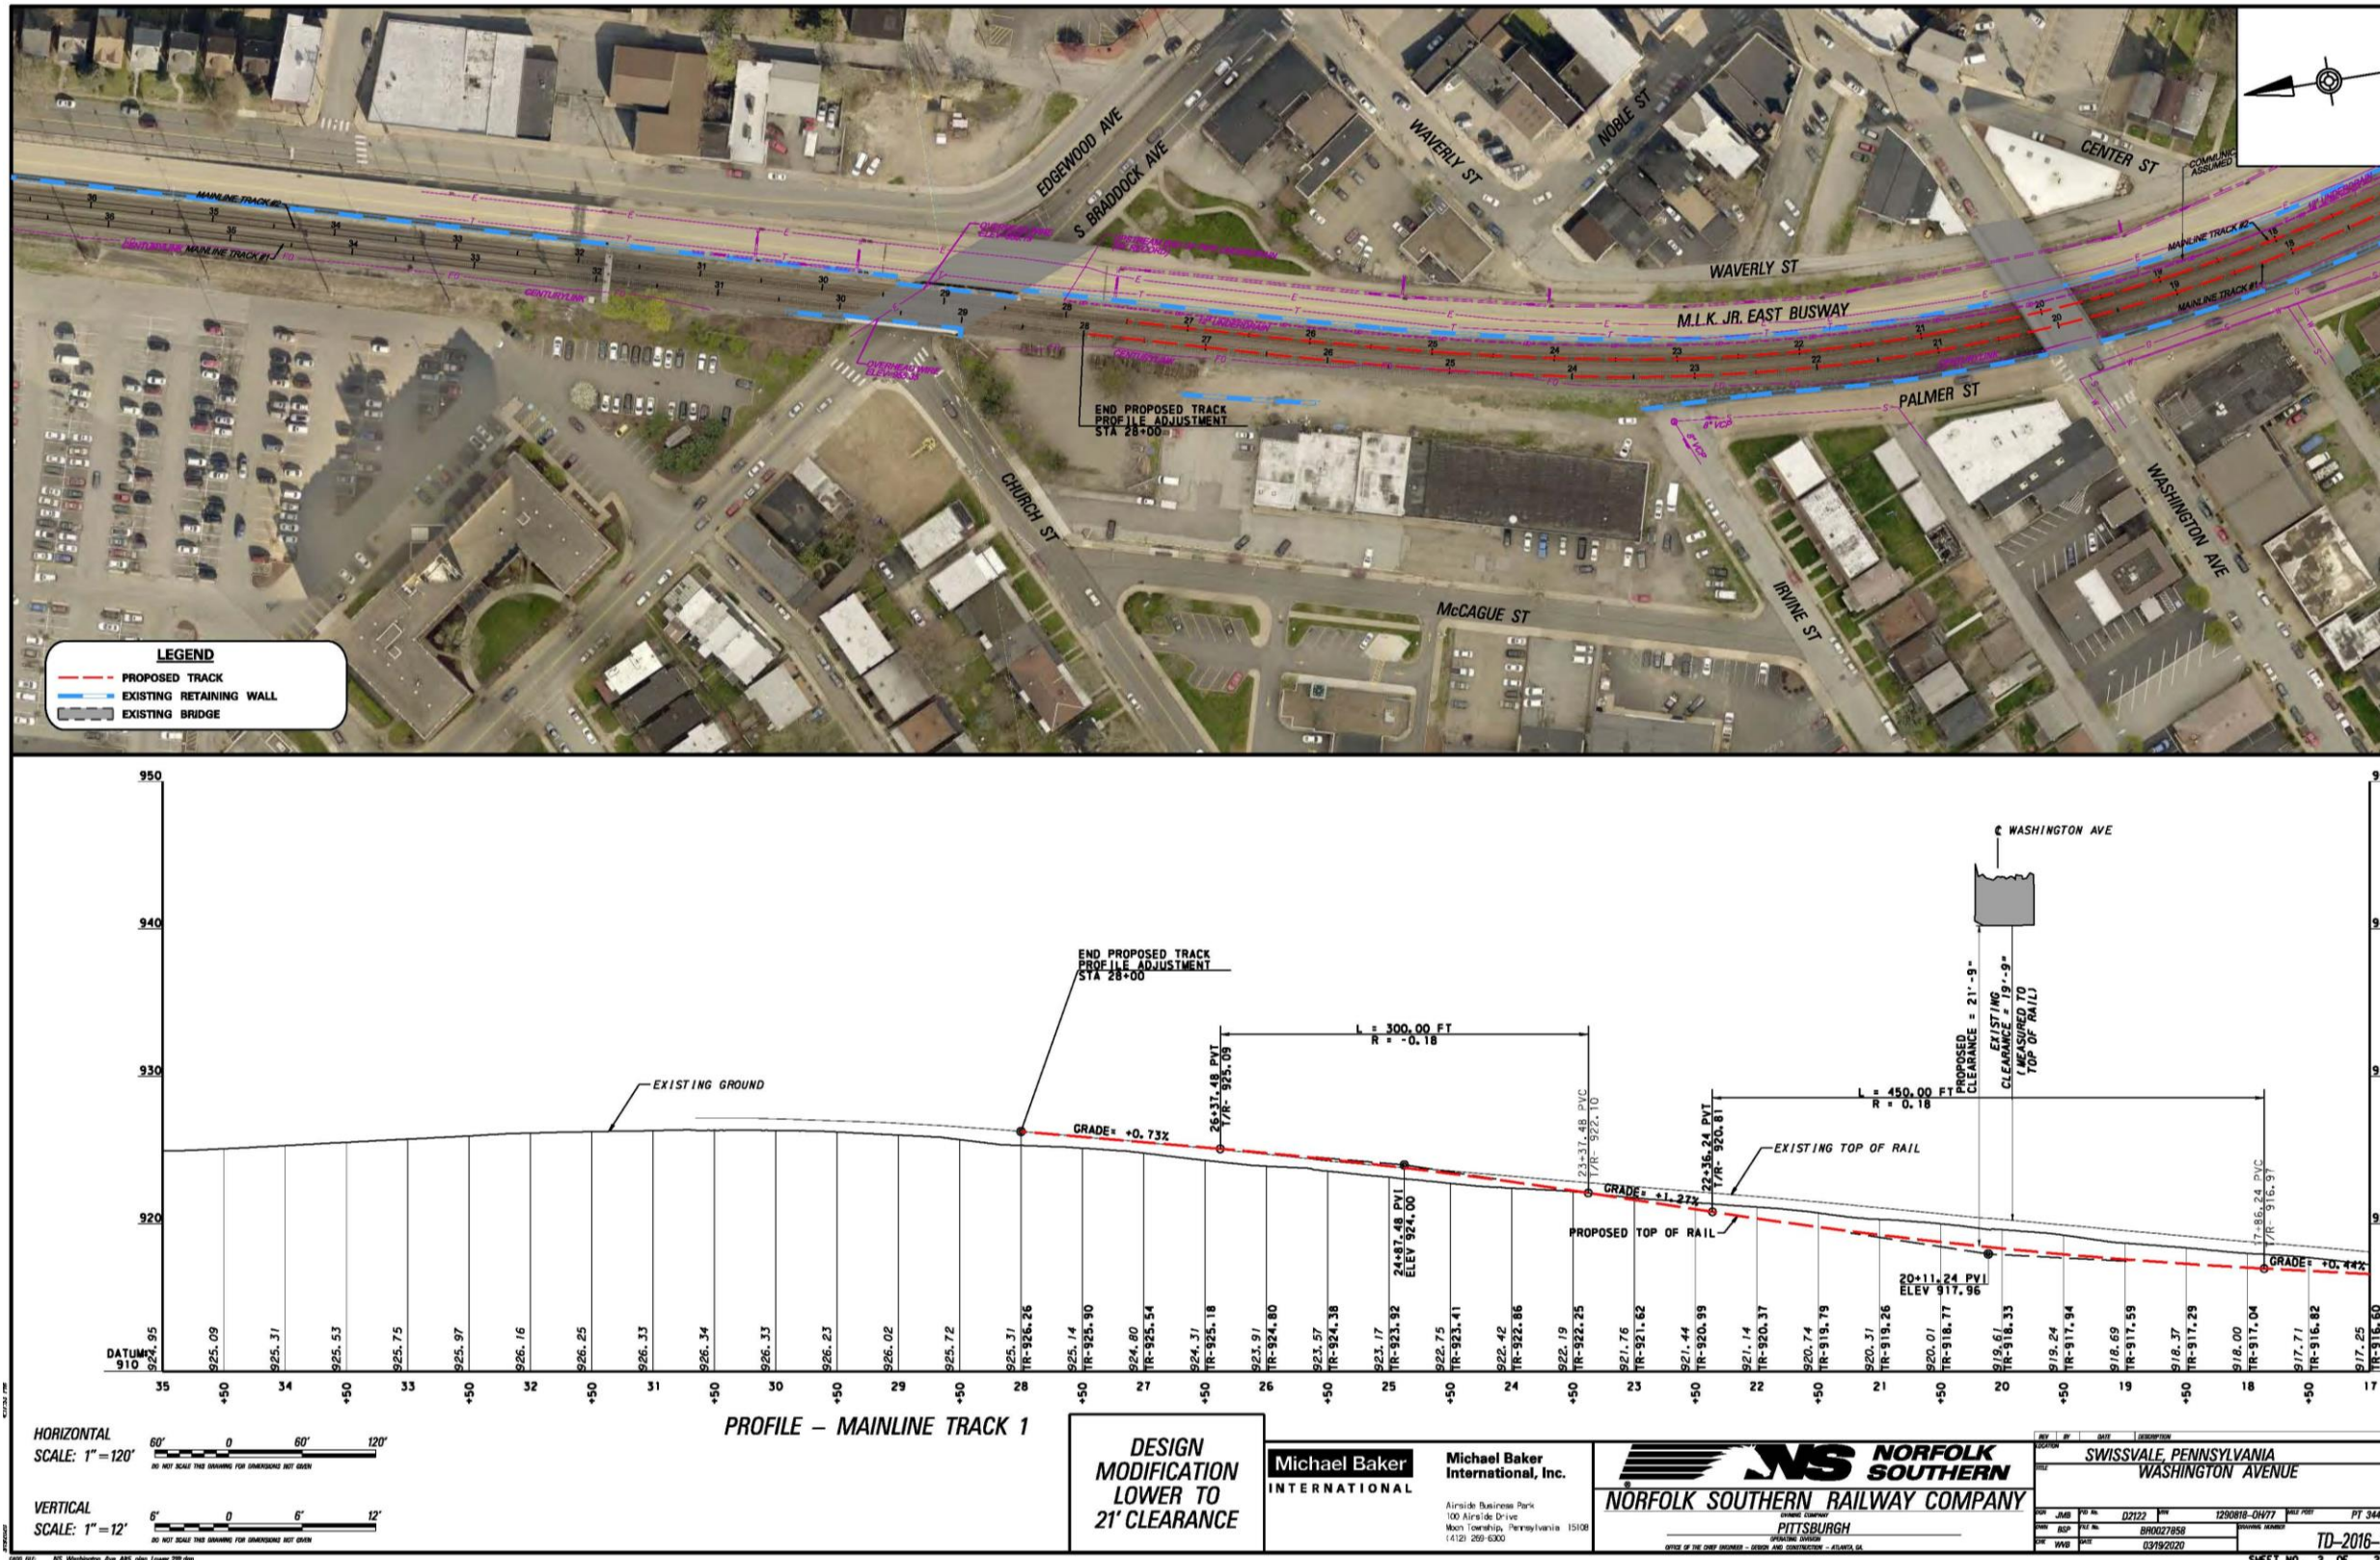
Plan and profile views of the track lowering under the Washington Avenue Bridge.
